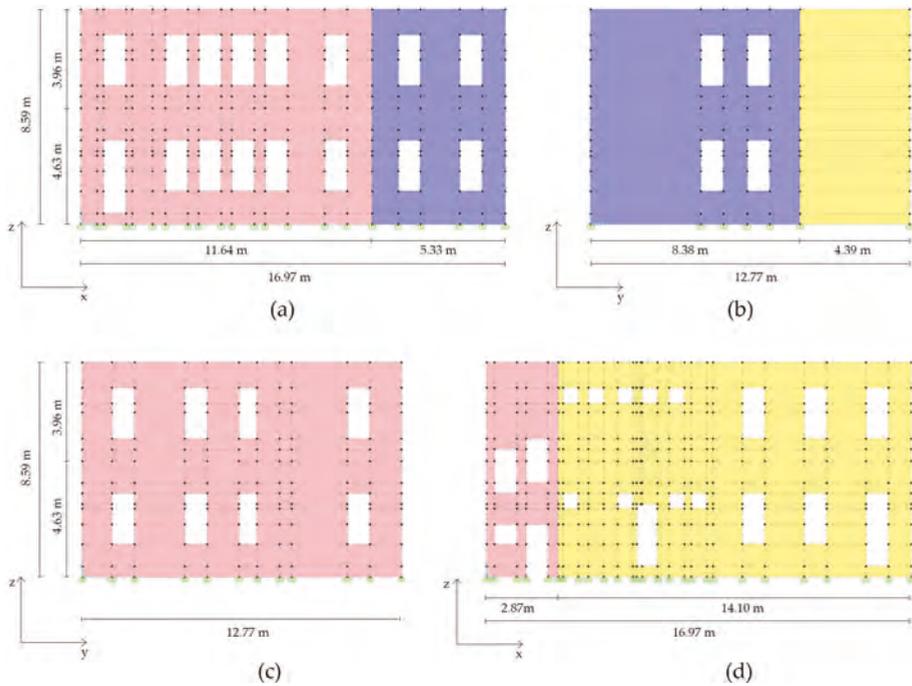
View of the model façades in the software SAP2000: (a) south façade; (b) west façade; (c) east façade; (d) north façade. The different colors represent the different kind of masonries: brick wall with 2 heads in pink, double brick wall according to the UNI specifications in yellow, and alveolar block wall in blue.
